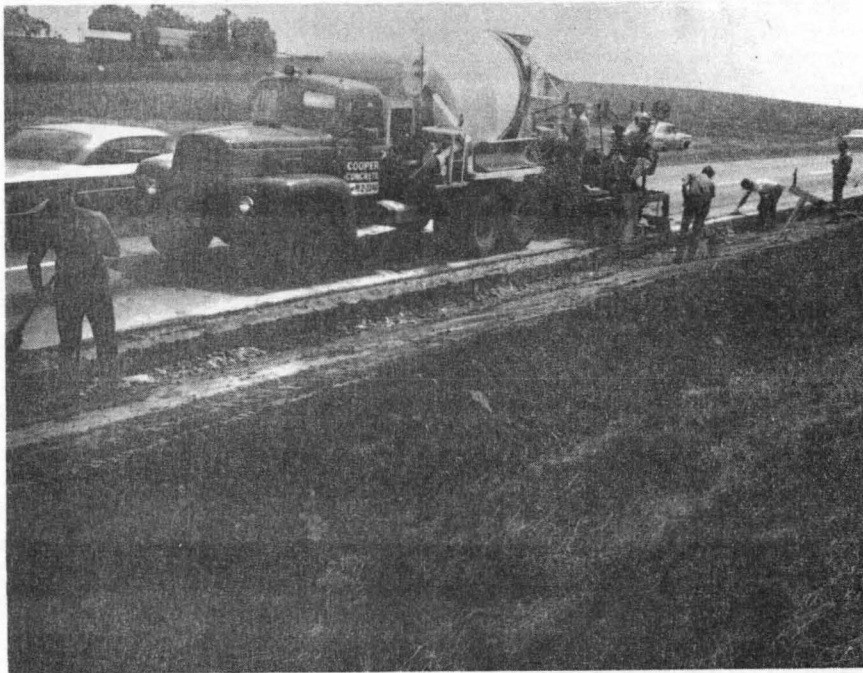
Slip-form paver placing ready-mixed concrete on curb section.
